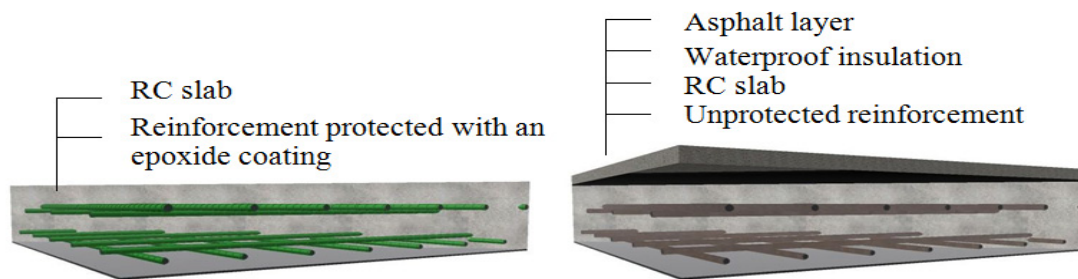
The RC bridge deck scheme with epoxide protection of reinforcement typical for the North East of the USA (left) and waterproof insulation typical for Central Europe (right)
